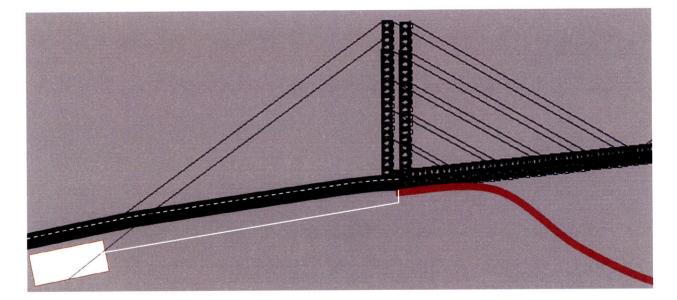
ANCHORING SCHEME WITH ONE CABLE
